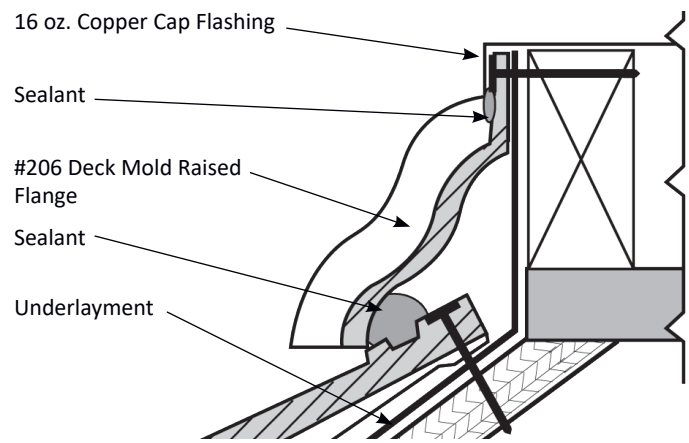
Deck Section with #206 Deck Mold Raised Flange
